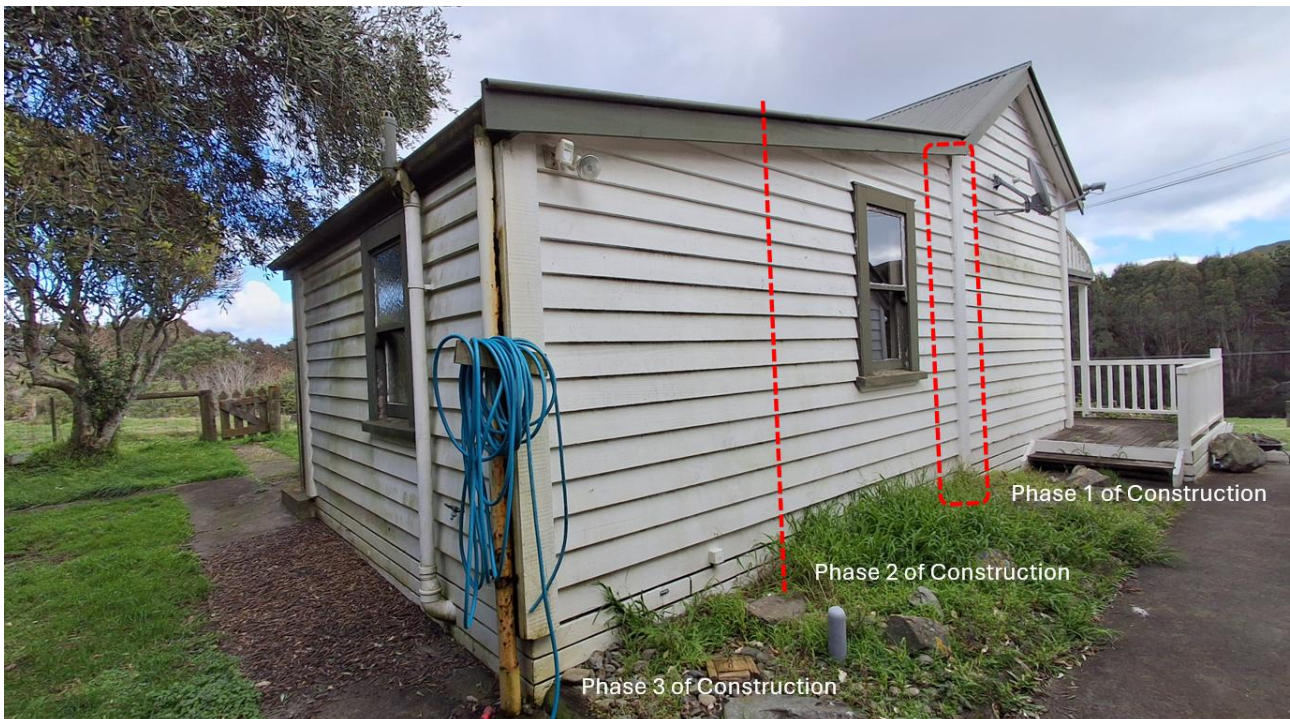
Gable end (north) elevation of the cottage which shows the vertical batten (outlined in red) where the first lean-to extension (Phase 2 of Construction) extends from the original gabled box cottage form (Phase 1 of Construction). The red line indicates where the most-recent lean-to extension (Phase 3 of Construction) extends beyond the first lean-to form (Phase 2 of Construction).
